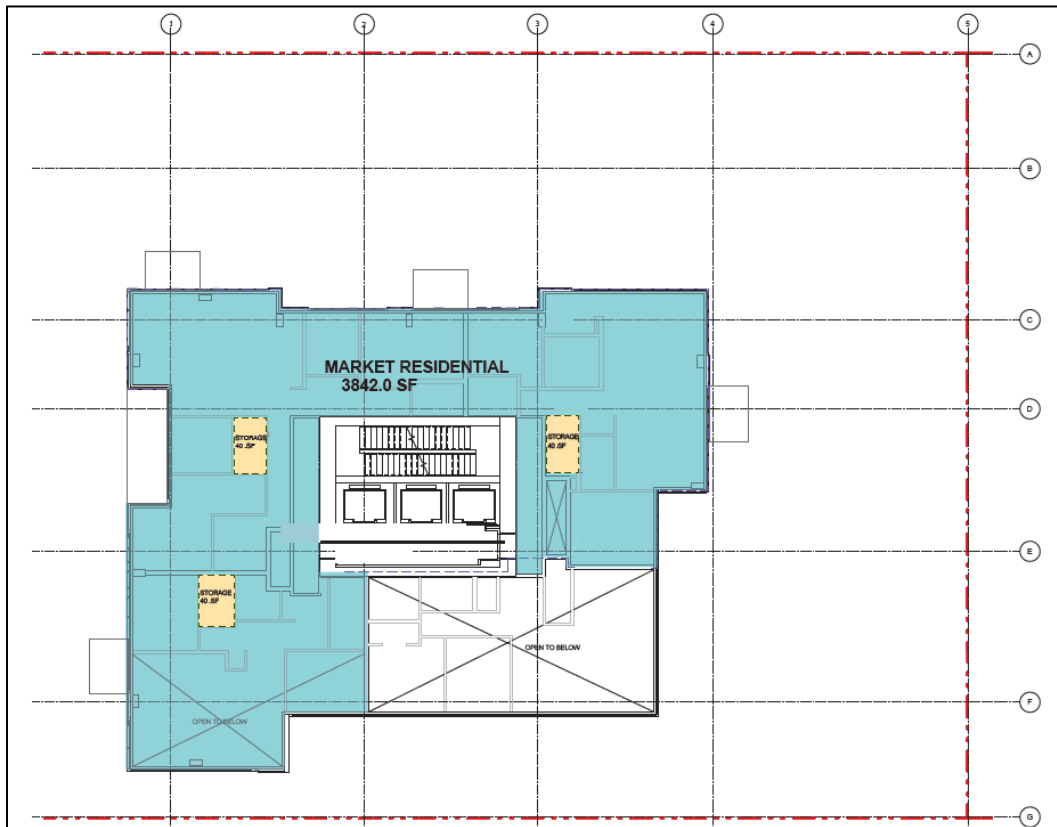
Plan of new Level 35 showing additional floor area in Sub-area B (Tower C) – upper floor of two-level units
